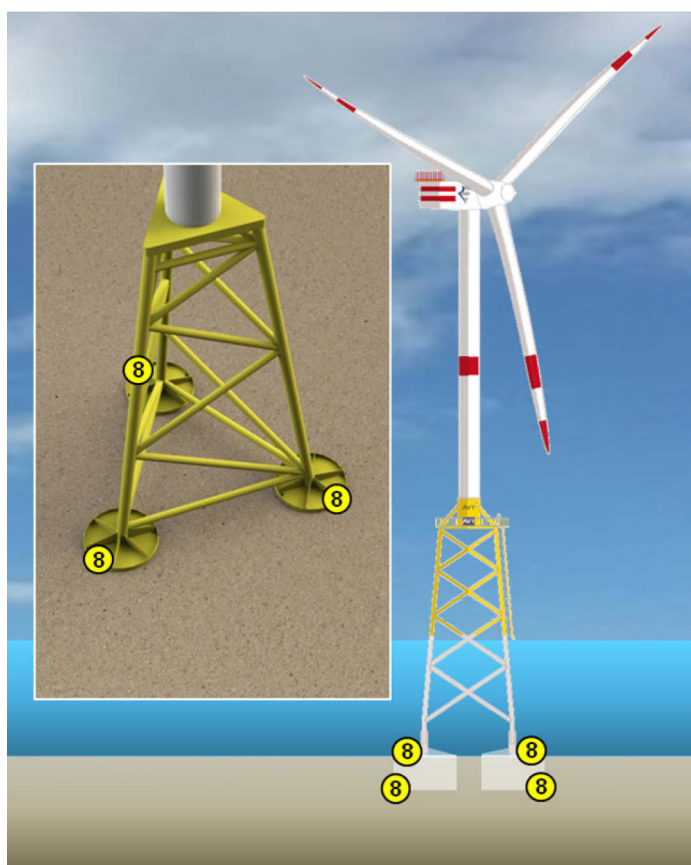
Caisson piezometers (8) on a tripod jacket with caisson foundations
